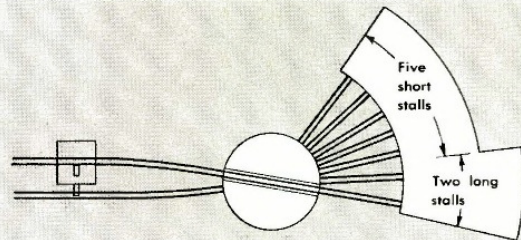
PROVISION FOR SERVICING LONG LOCOS WITHOUT MAKING TURNTABLE AND OTHER PARTS OF ROUNDHOUSE EXCESSIVELY LARGE
